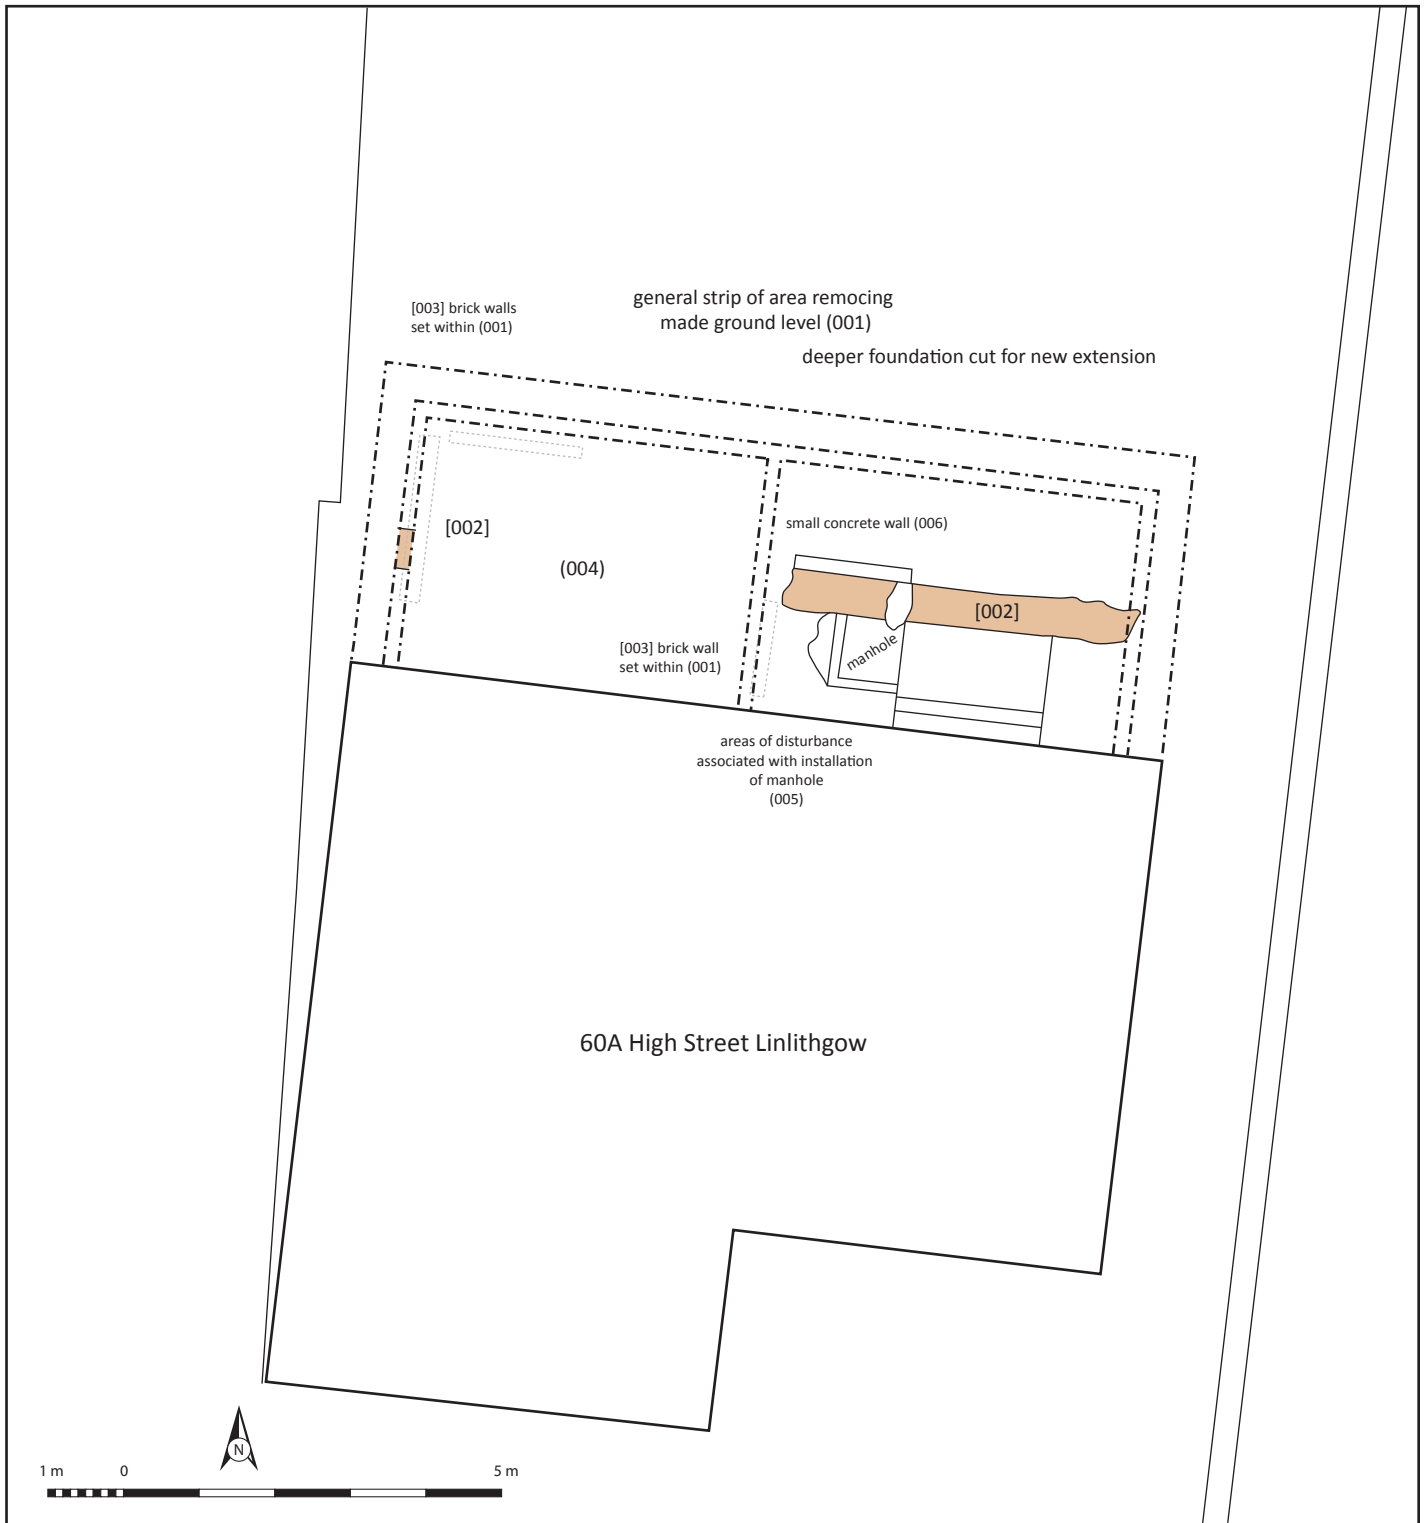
Site plan showing areas subject to watching brief and features encountered after removal of (101)
